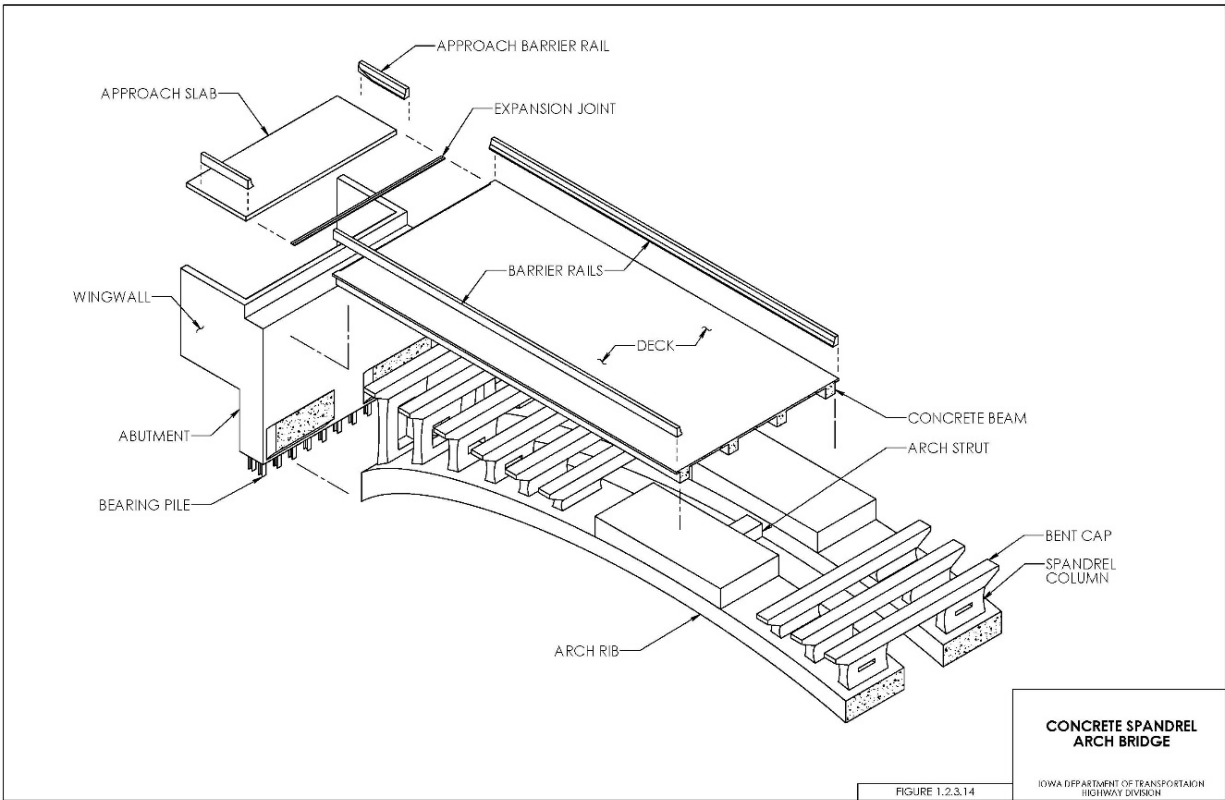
Concrete Open Spandrel Arch Bridge Components
